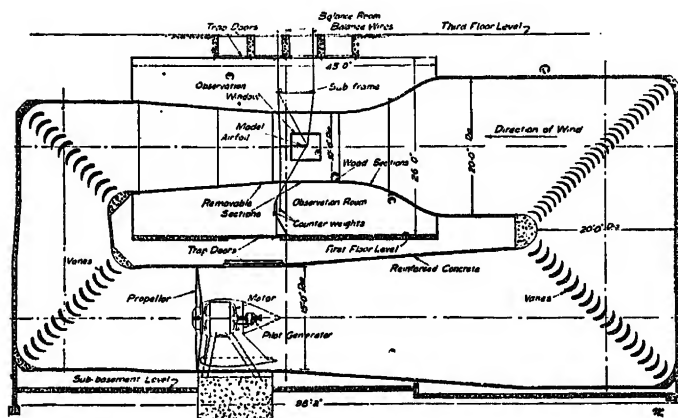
LONGITUDINAL SECTION OF THE WIND TUNNEL (VERTICAL PLANE)
